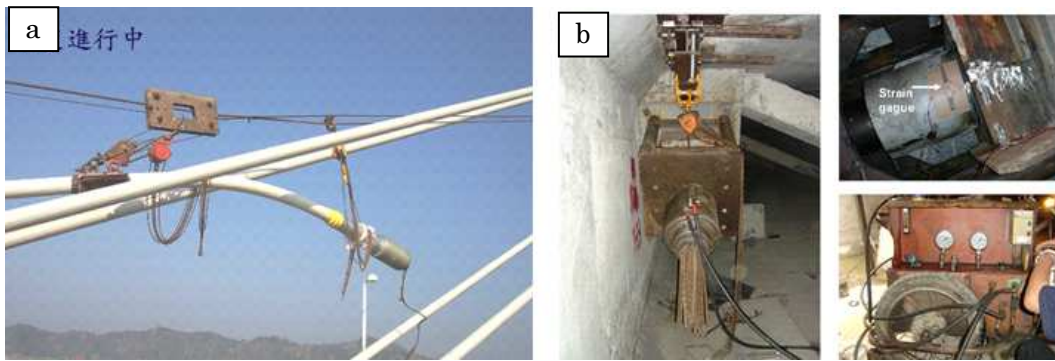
Repair of the cable system : (a) a cable with new anchor was hanged to the pylon, (b) the cable force was measured and tensioned inside the girder
